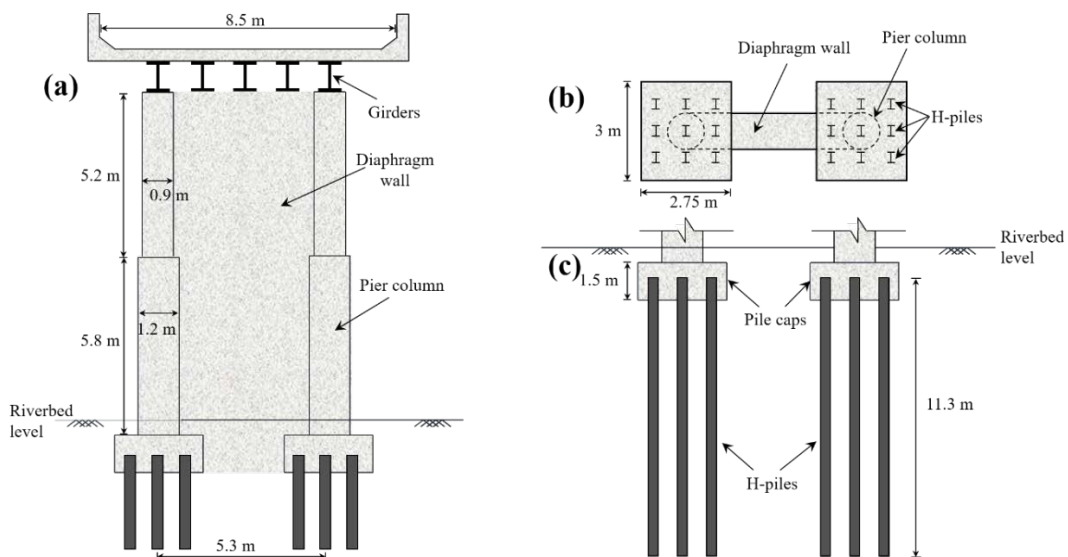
Layout of bridge pier with pile configuration (a) piers and superstructure (b) plan view of pile caps (c) side view of pile caps and H-piles.
